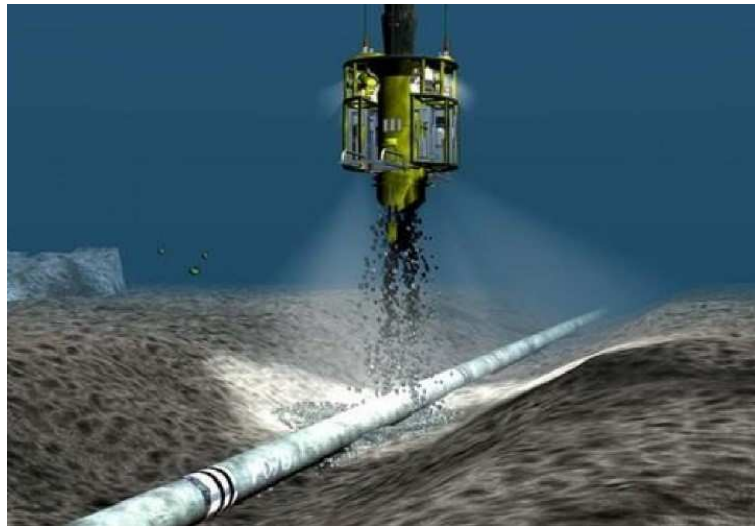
Ramming of subsea pipeline in deep water area
